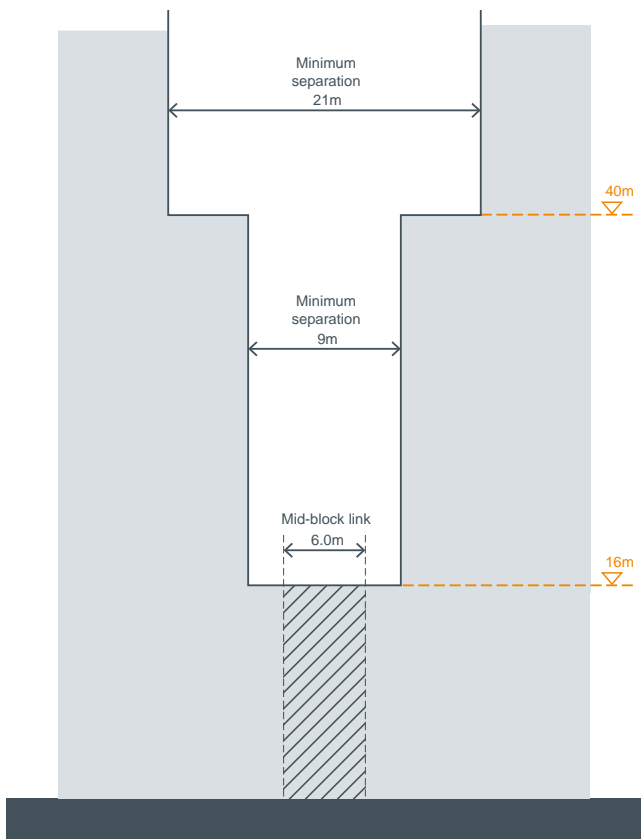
Section showing minimum separation distances between buildings within the same site and a minimum 6m separation where a through-site link is required.
